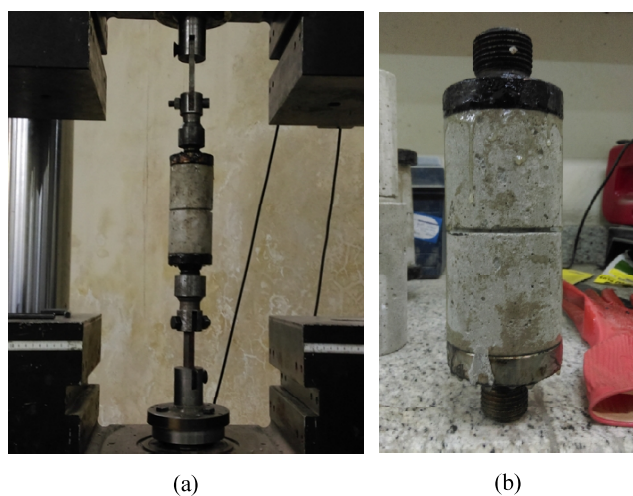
(a) Direct Tensile test setup (b) Direct tensile test specimens glued to plates
